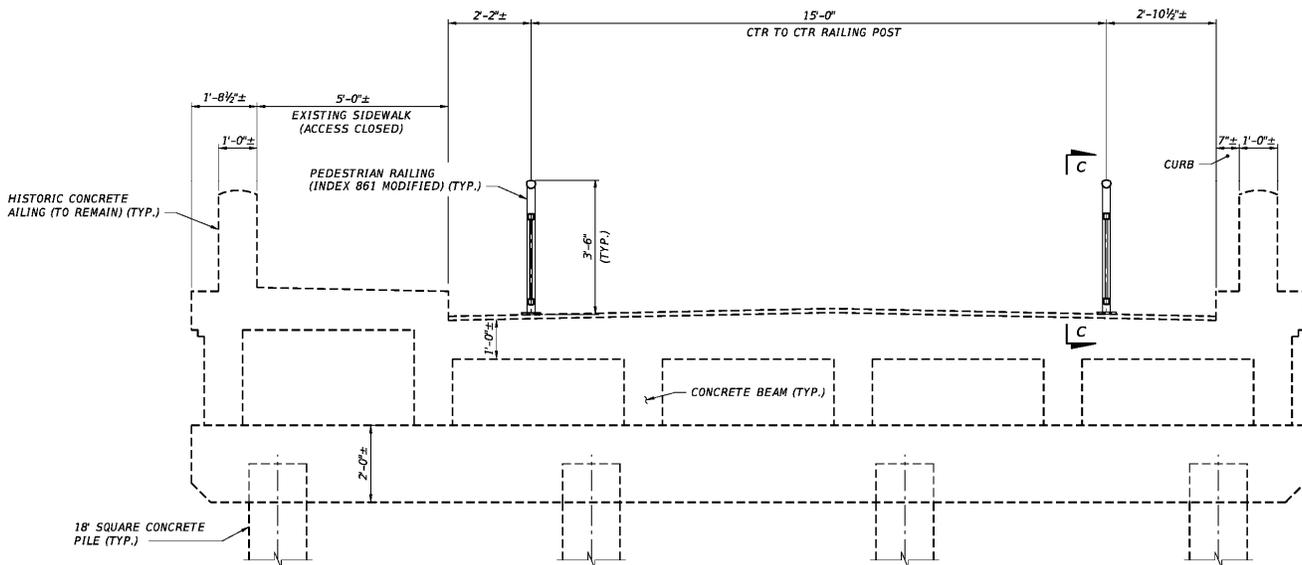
BUILD ALTERNATIVE 3 – EXISTING BRIDGE TO REMAIN
